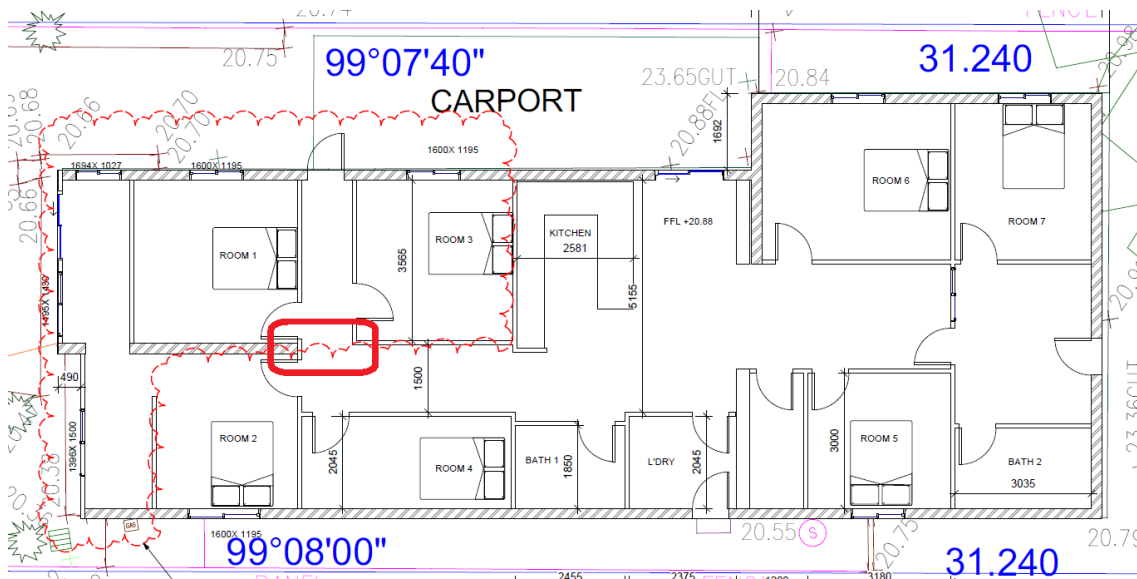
Current floor layout of the existing dwelling house (source: AKT Engineering & Consulting)
